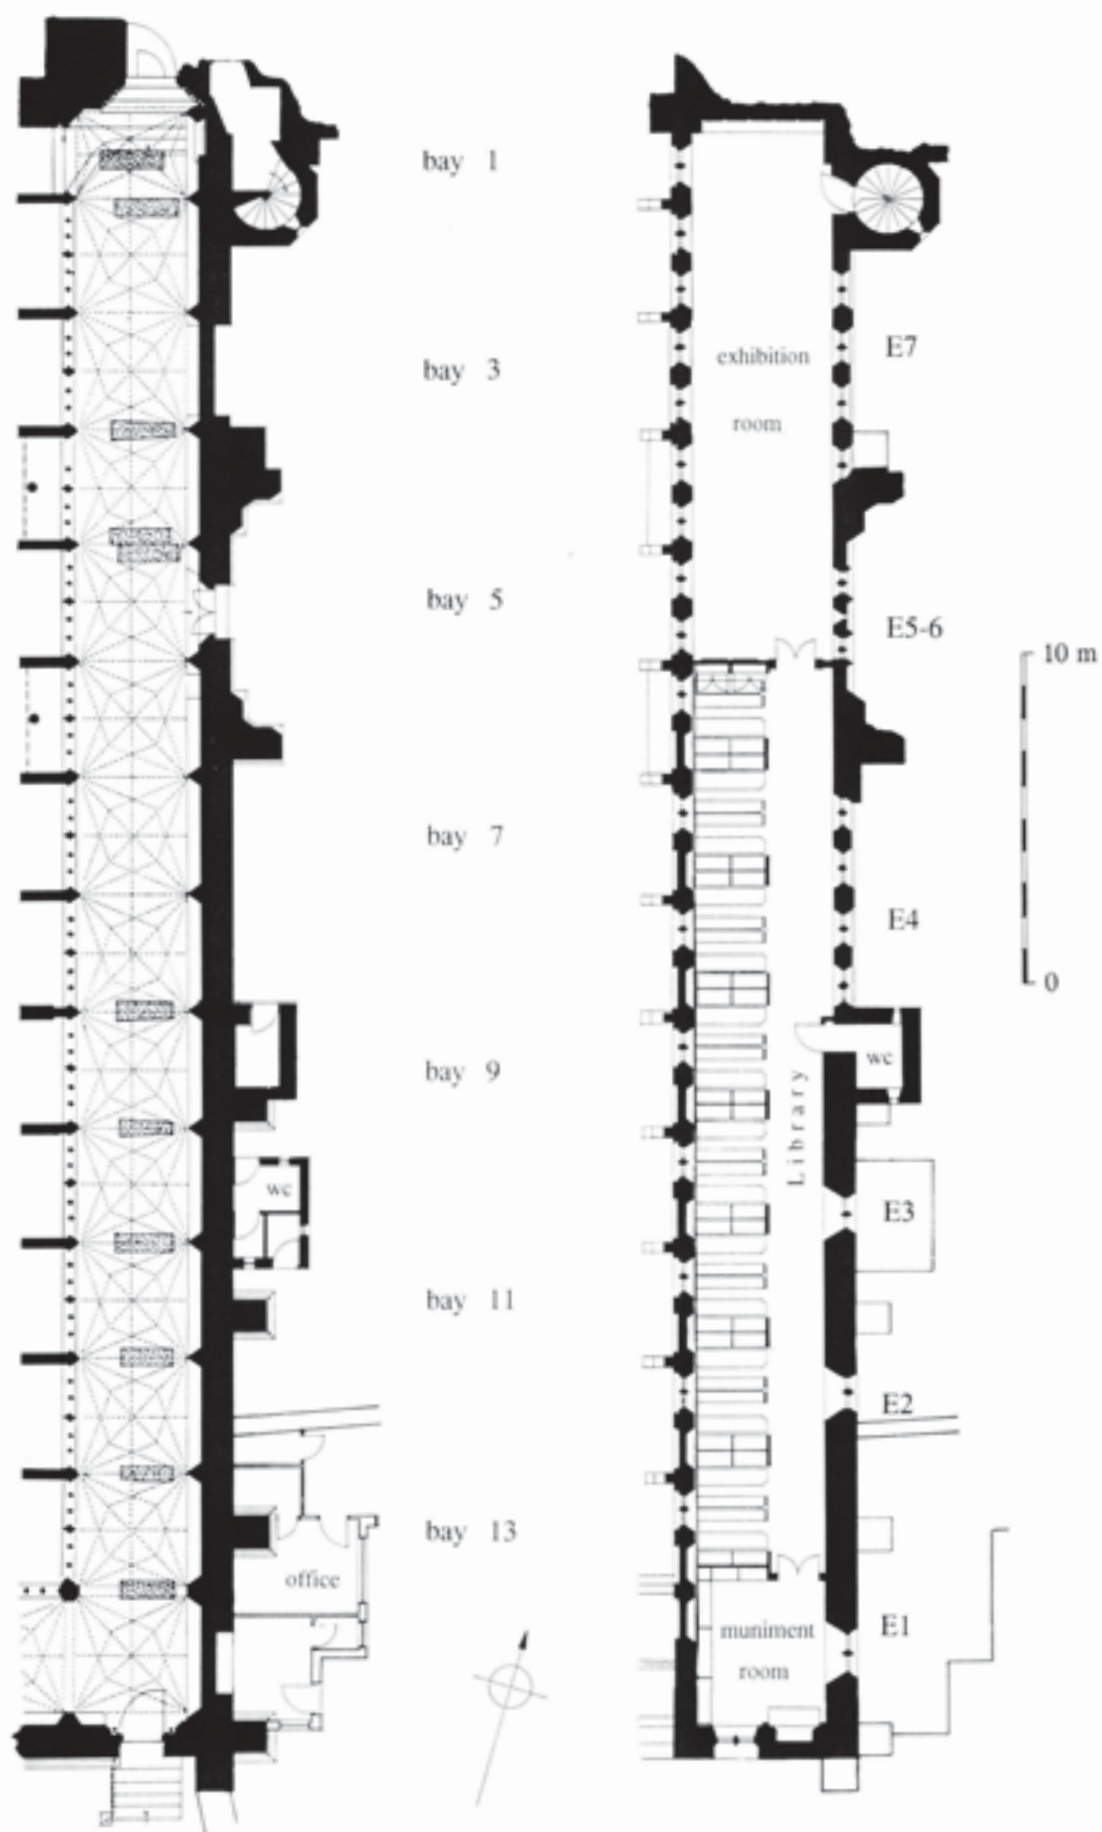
Plans of the east cloister at ground and first-floor levels (1978). The positions of graves marked on Carter's plan of c. 1795 are indicated. The bay divisions of the external wall elevation are numbered E₁ to E₇
